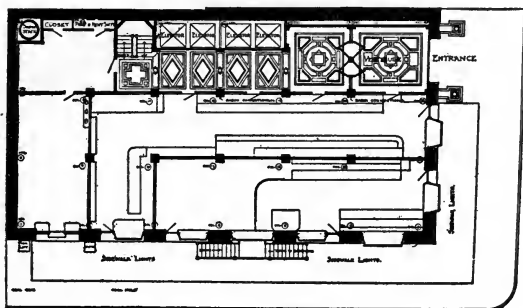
Broadway Chambers, New York City. Ground-floor Plan.
